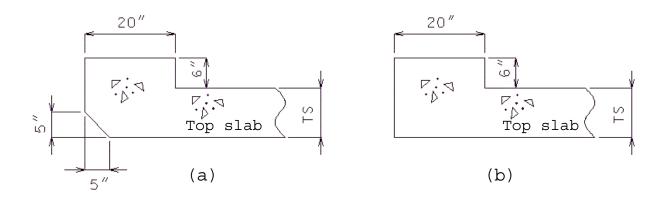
Typical cross section of headwalls and edge beams (a) upstream headwall (b) downstream headwall or edge beam.
